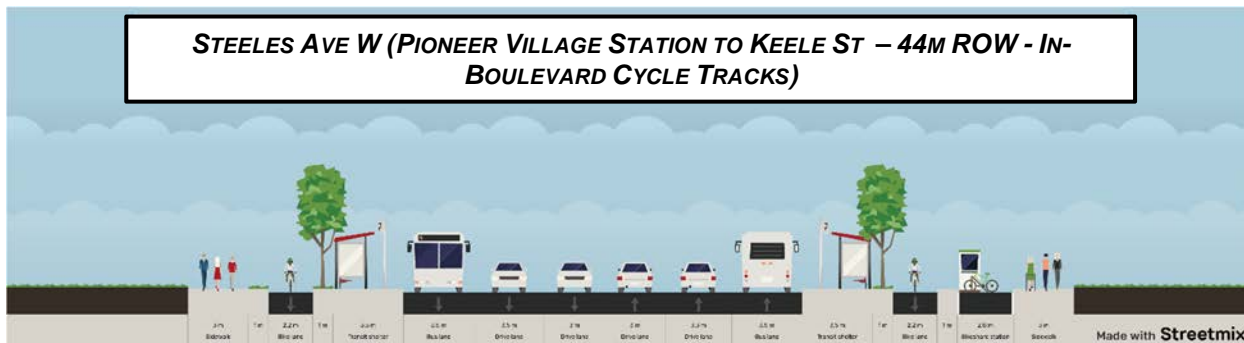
STEELES AVENUE WEST – CONCEPTUAL CROSS-SECTION FOR 44-METRE ROW
